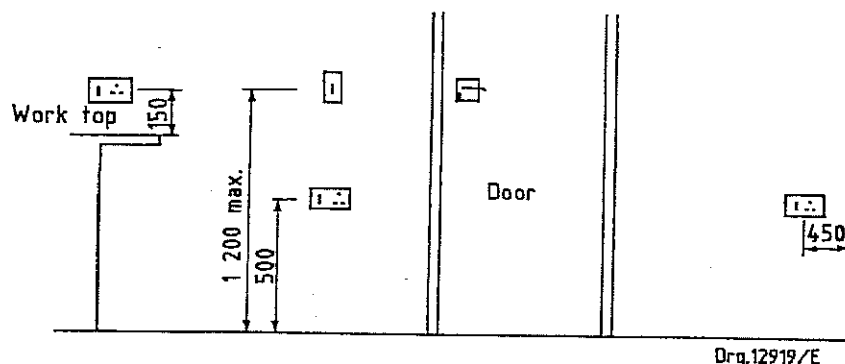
Heights for switches, general purpose socket-outlets and door handles
